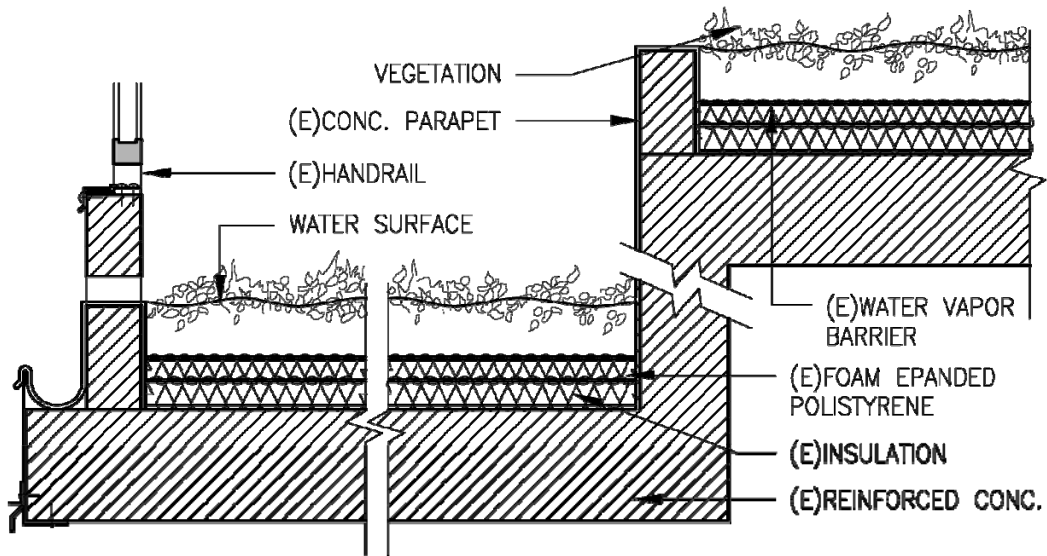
Detailed Section Drawing of Terraced Hydroponics at Rooftop
